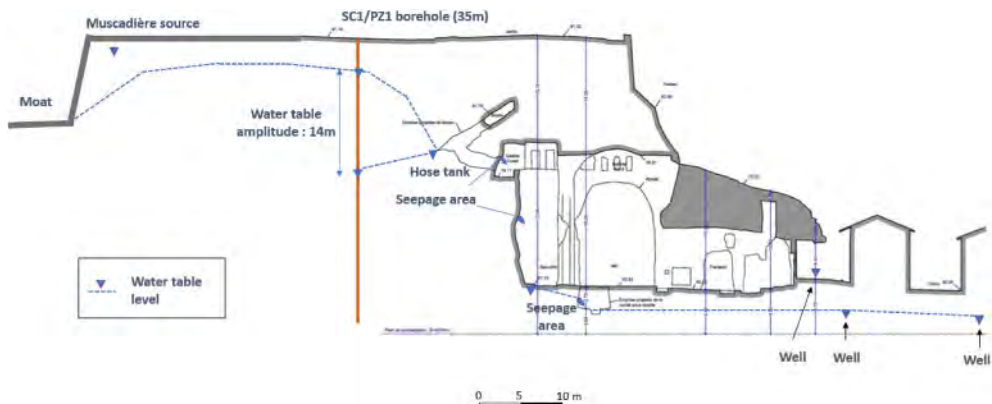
West/East cross section with position of water level and inflows (Antea Group).
